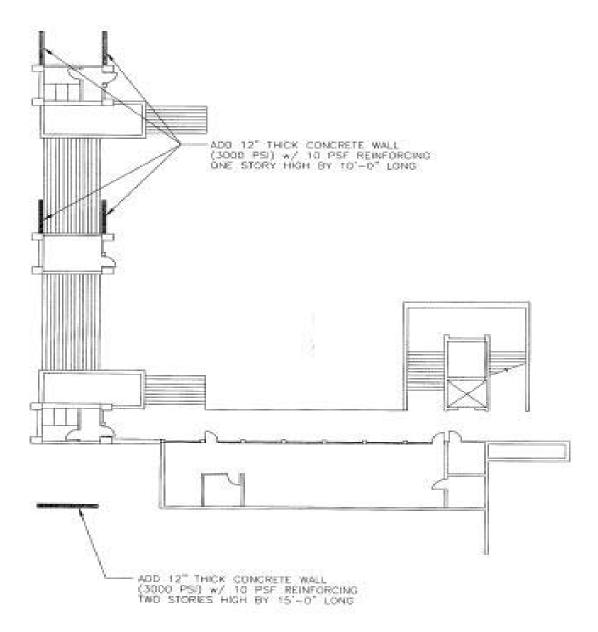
PROPOSED ADDITIONAL WALL LOCATION
